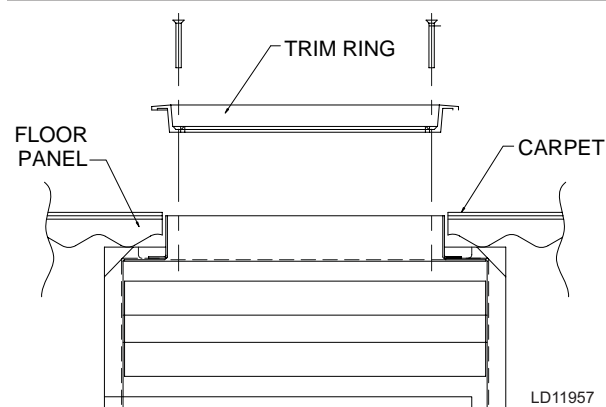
TRIM RING INSTALLATION (MIT-2A SHOWN)
